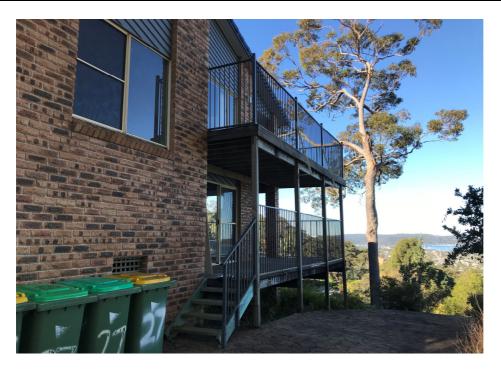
View from the west toward the site of the proposed Carport 2. Note existing hardstand concrete area the Carport is to be located over.
